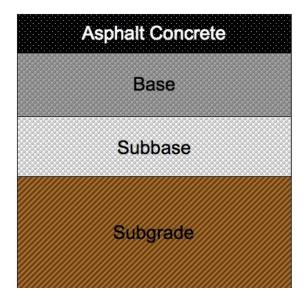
TYPICAL PAVEMENT CROSS SECTION
